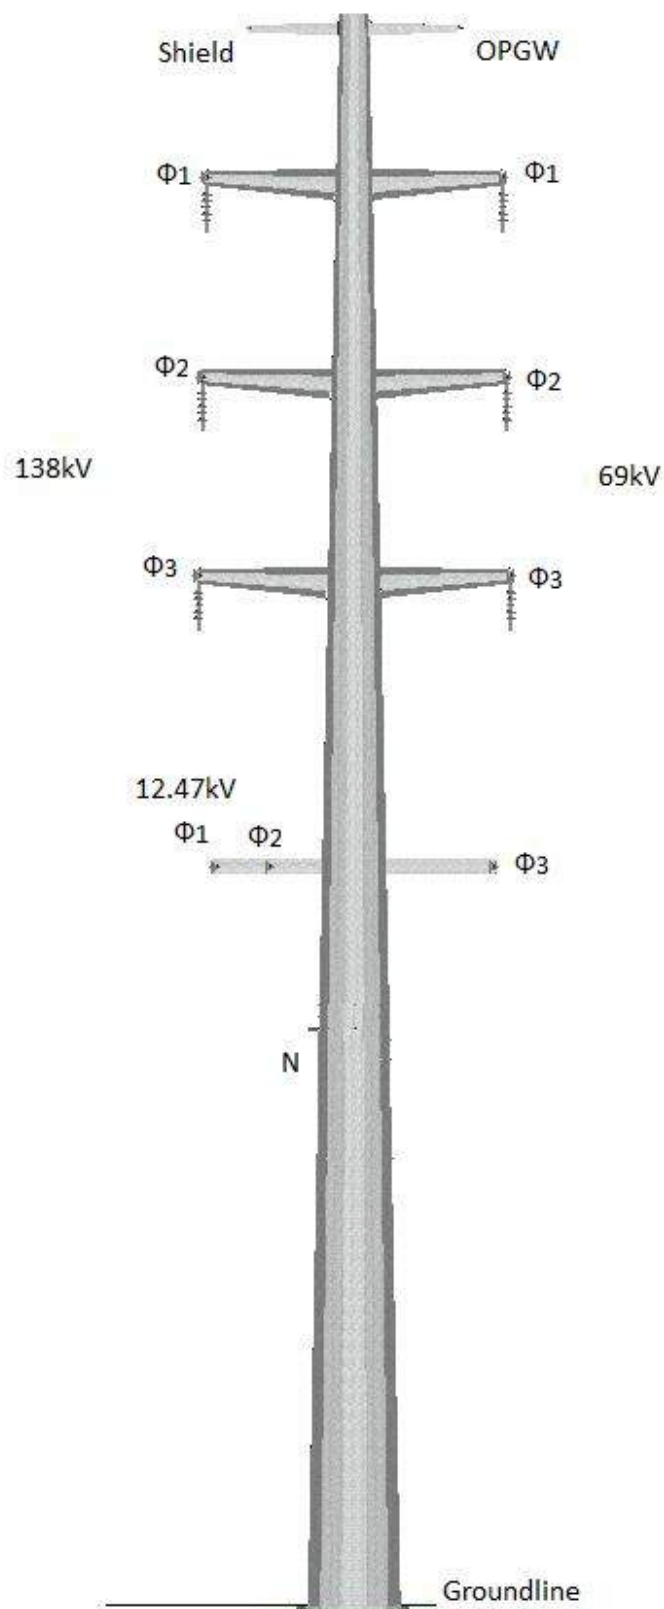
Typical cross-section model used for EMF calculations for Section 3A.
